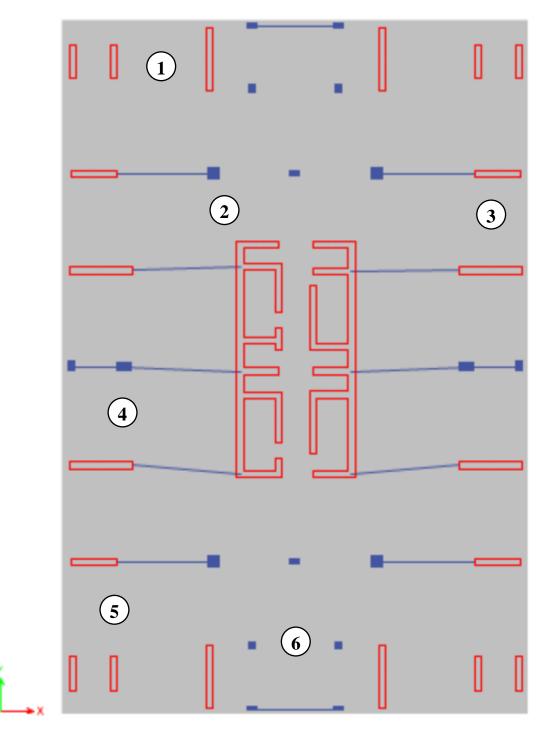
Final residential floor plan (Sample: 40th residential floor)
